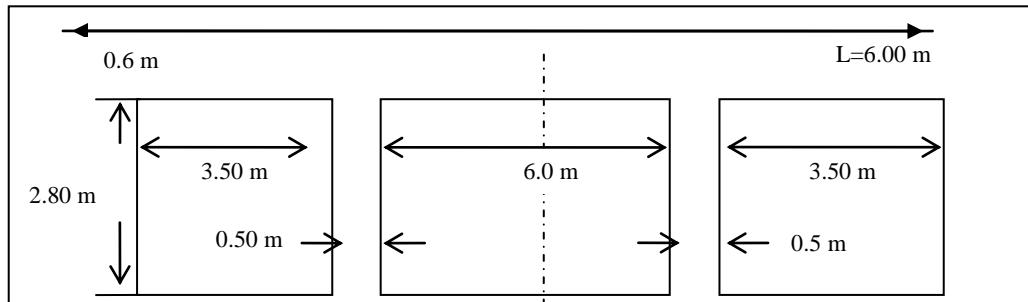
Dimensions of the proposed bridge at Section 6 on Fabrika Creek
